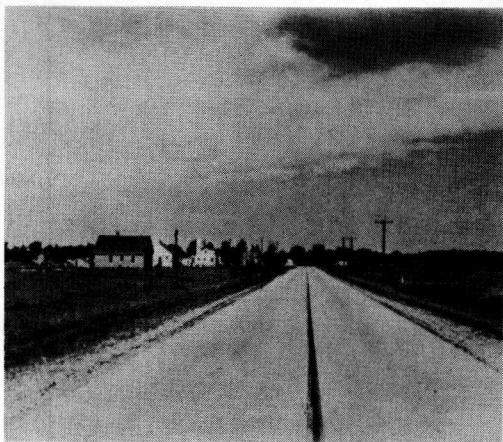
Pavement constructed in 1927 without transverse joints, Clyde soil in foreground, Fox soil in background; crack interval ranges from 15 to 50 feet or more. Photo taken in 1944 by A. T. Bleck.
